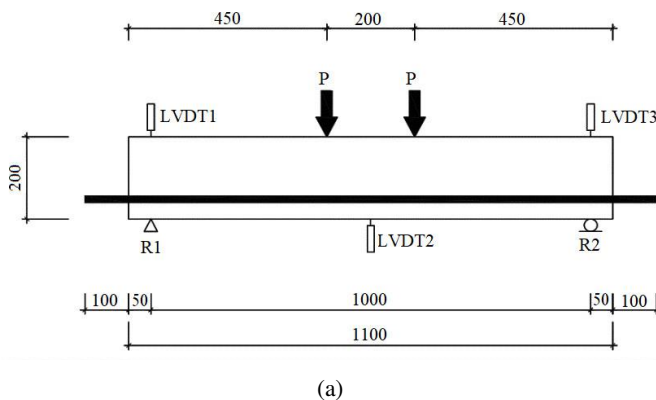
Details of test specimens and loading arrangement of four-point loading test
